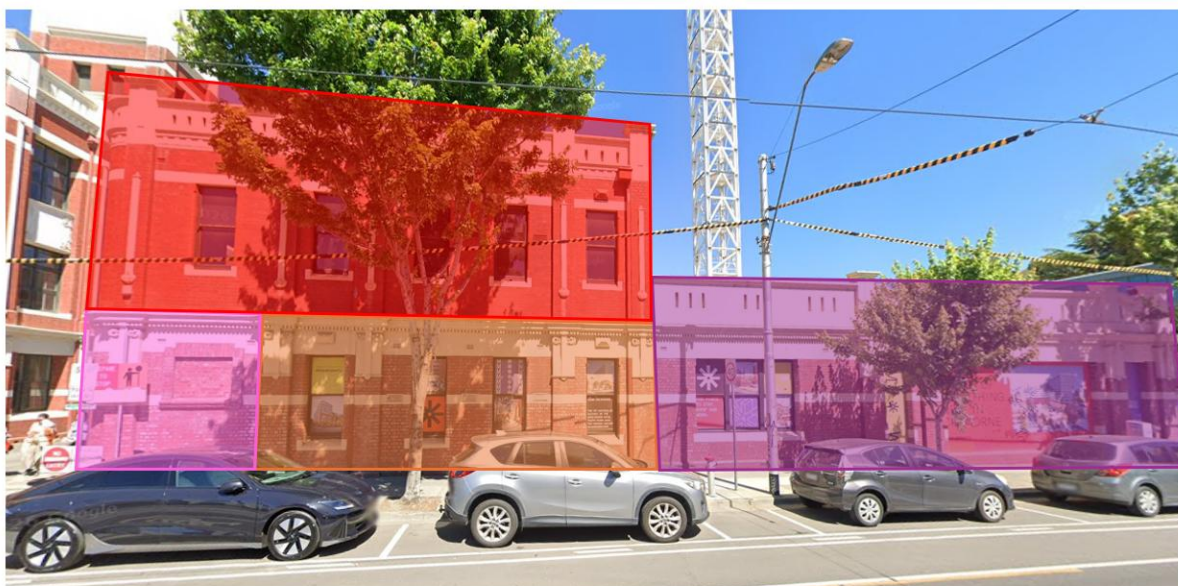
Phases of development at the former Administration Building - Eastern (Church Street) elevation.
